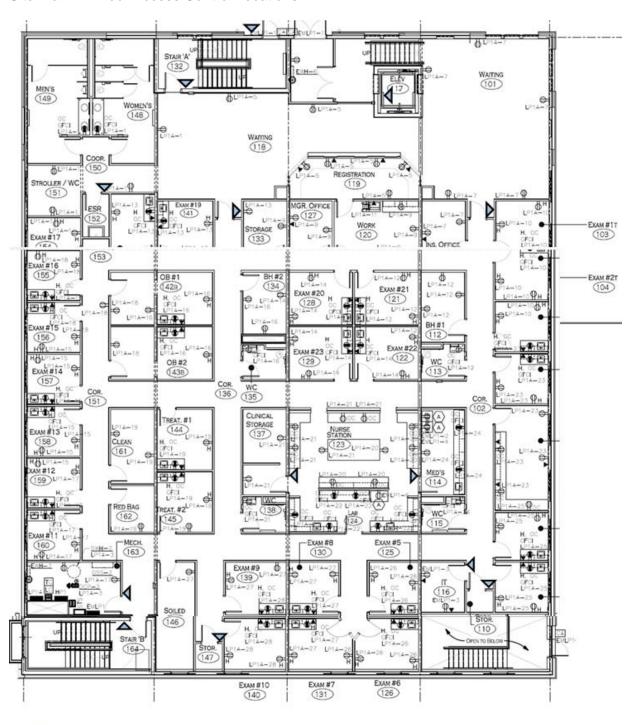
Exhibit F: Site Floorplan for Access Control Scanners- Outside Access
